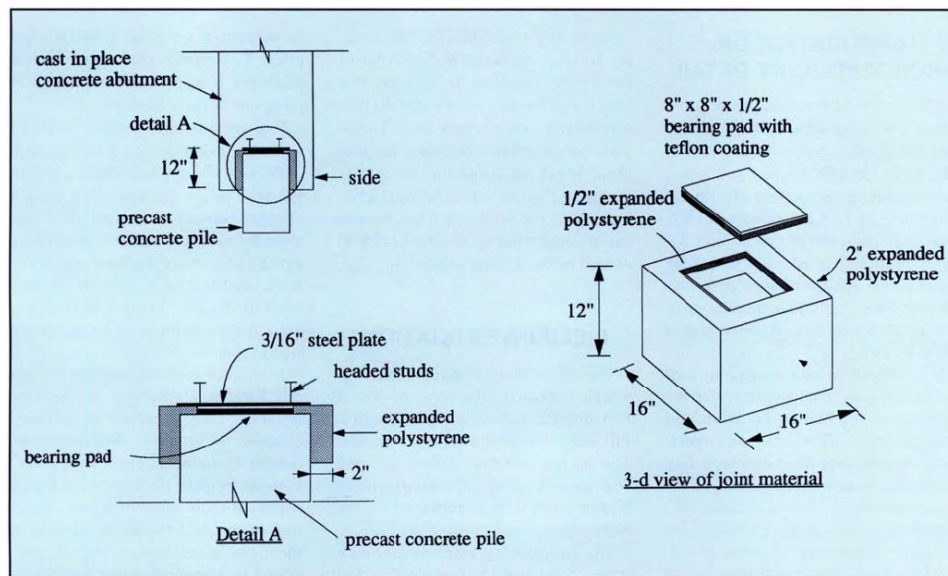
Proposed concrete pile-abutment joint (Kamel, et al. 1996).
